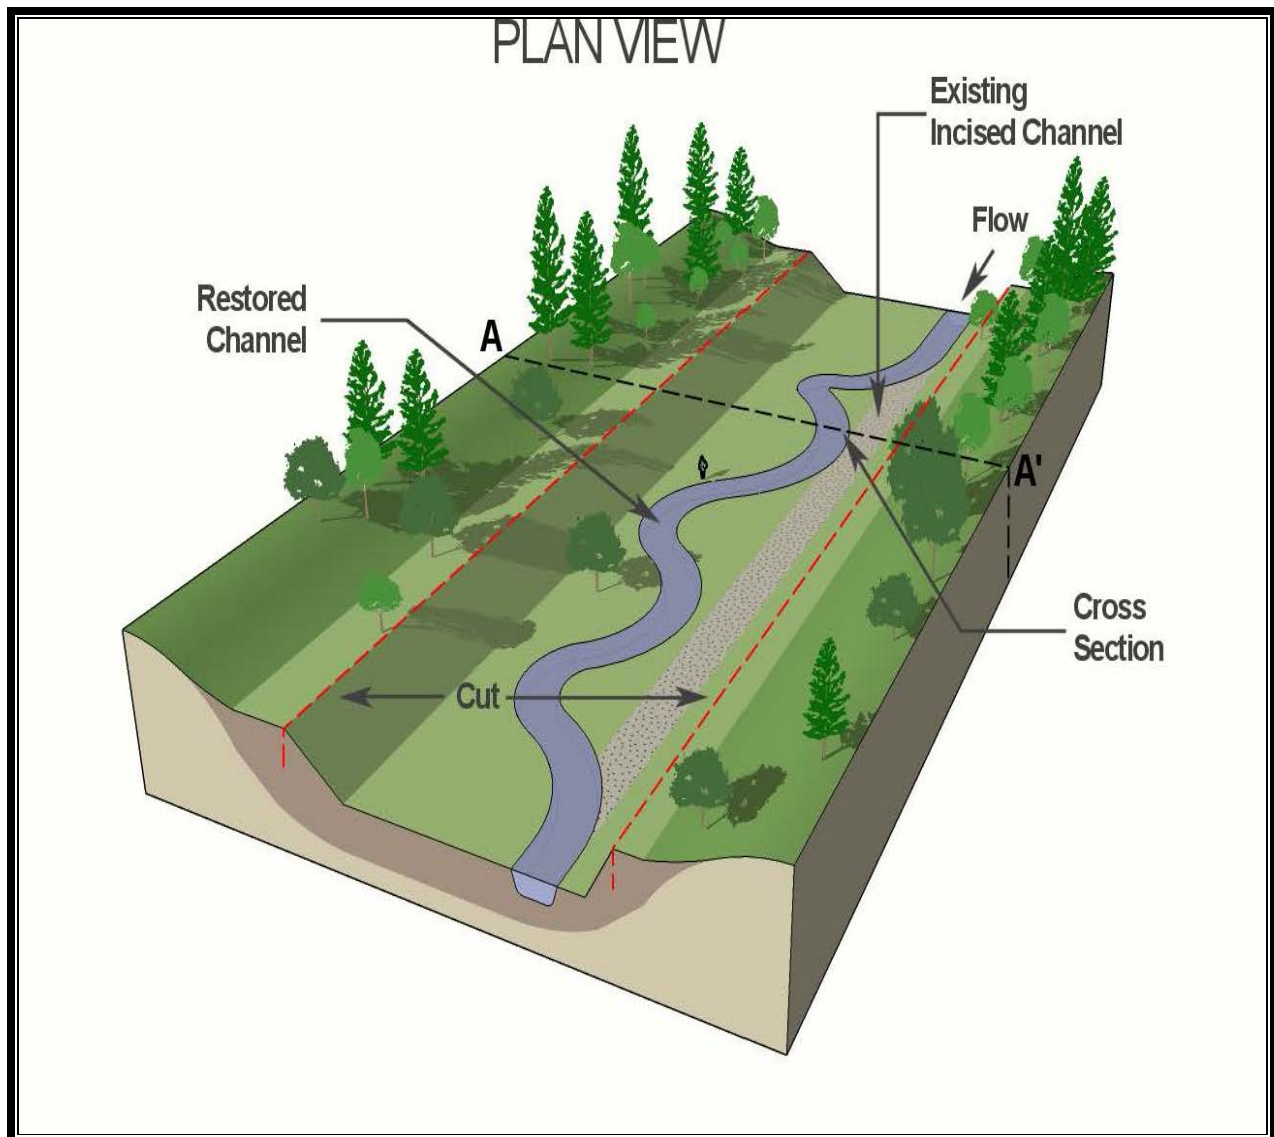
P2-FLOODPLAIN EXCAVATION APPROACH-PLAN VIEW
